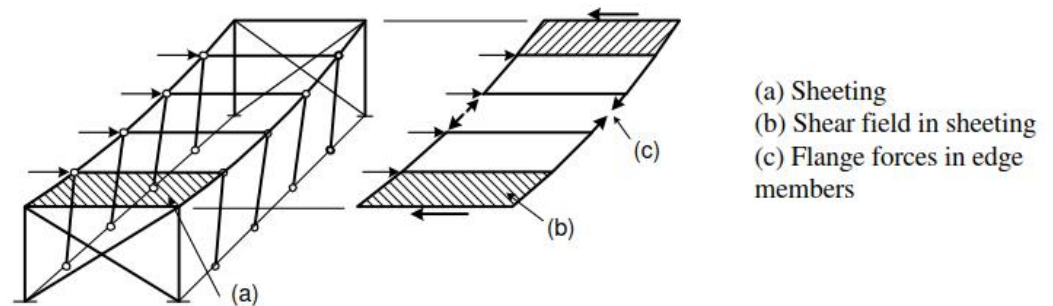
Stressed skin action in a flat-roof building (SFS-EN 1993-1-3)
